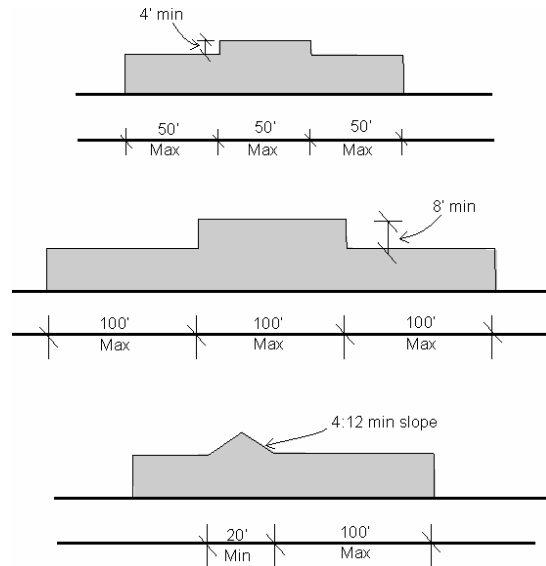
Roofline standards for non-residential and mixed-use buildings.
